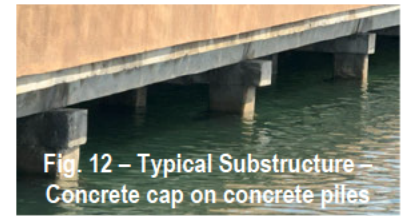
Typical Substructure – Concrete cap on concrete piles
